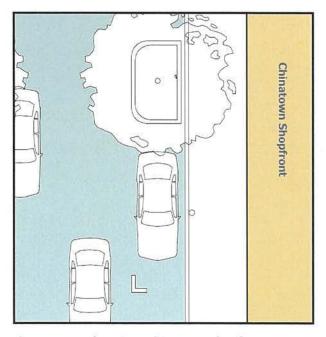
Plan View, Chinatown Shopfront Frontage (Illustrative; canopy roof not shown)
